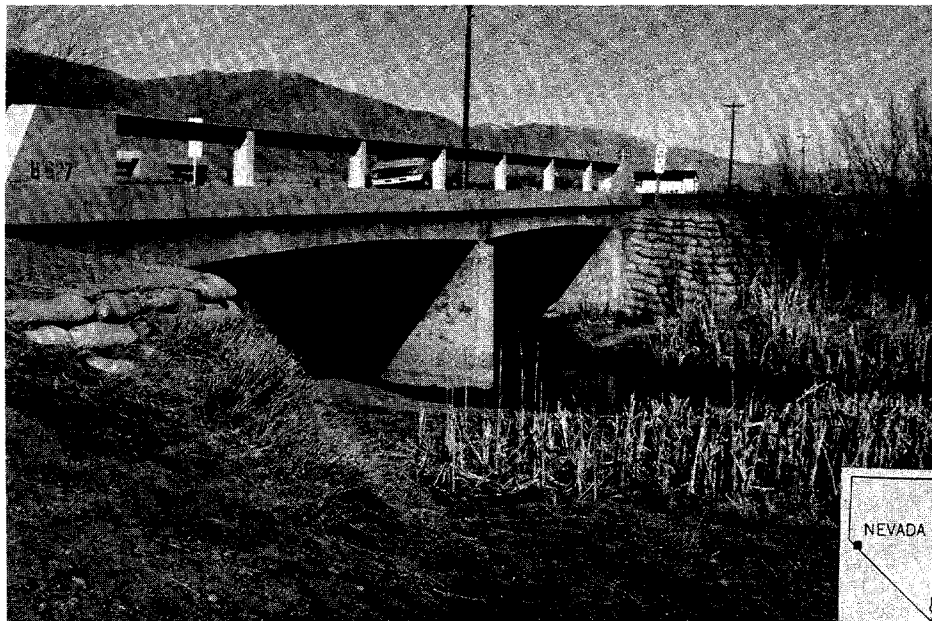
Sacked concrete revetment on upstream side of SR-88 bridge at Rocky Slough, February 1976. (From Nevada Dept. of Highways.)
